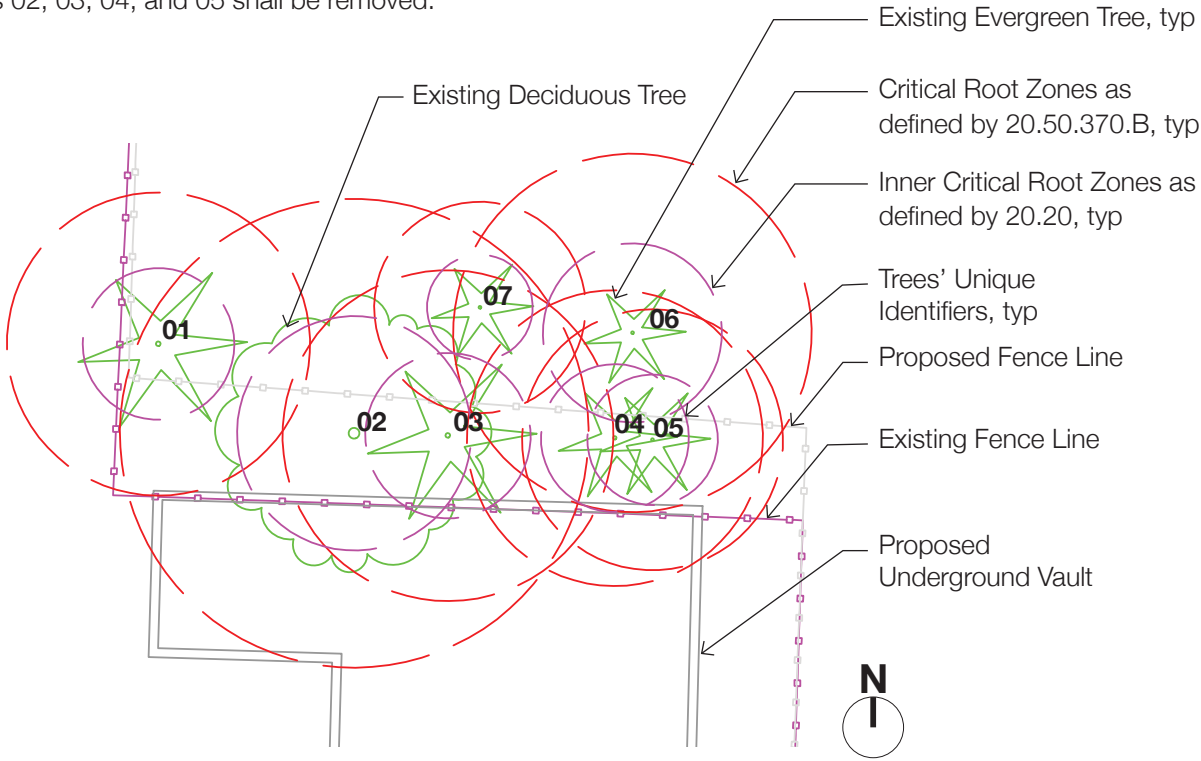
1:20 scale tree protection plan showing tree locations and critical root zones in relation to the underground vault.
